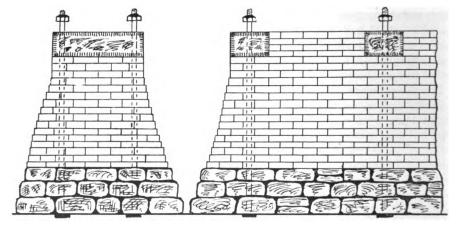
SHOWING SIDE AND END PLANS OF ENGINE FOUNDATION.
